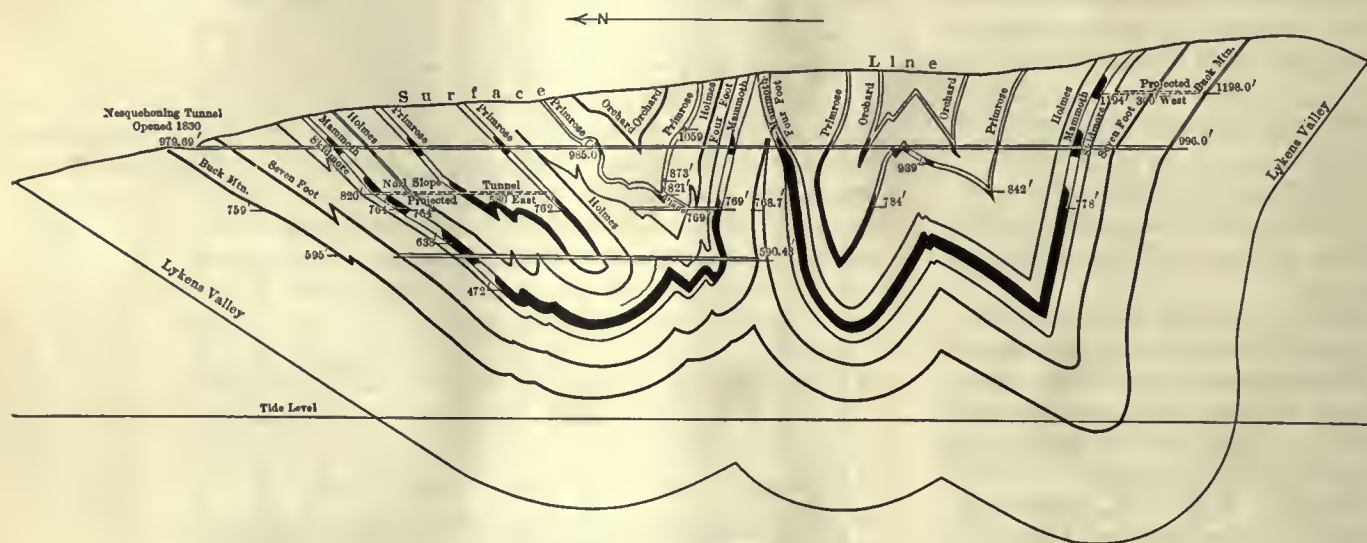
CROSS-SECTION OF THE NESQUEHONING TUNNEL
